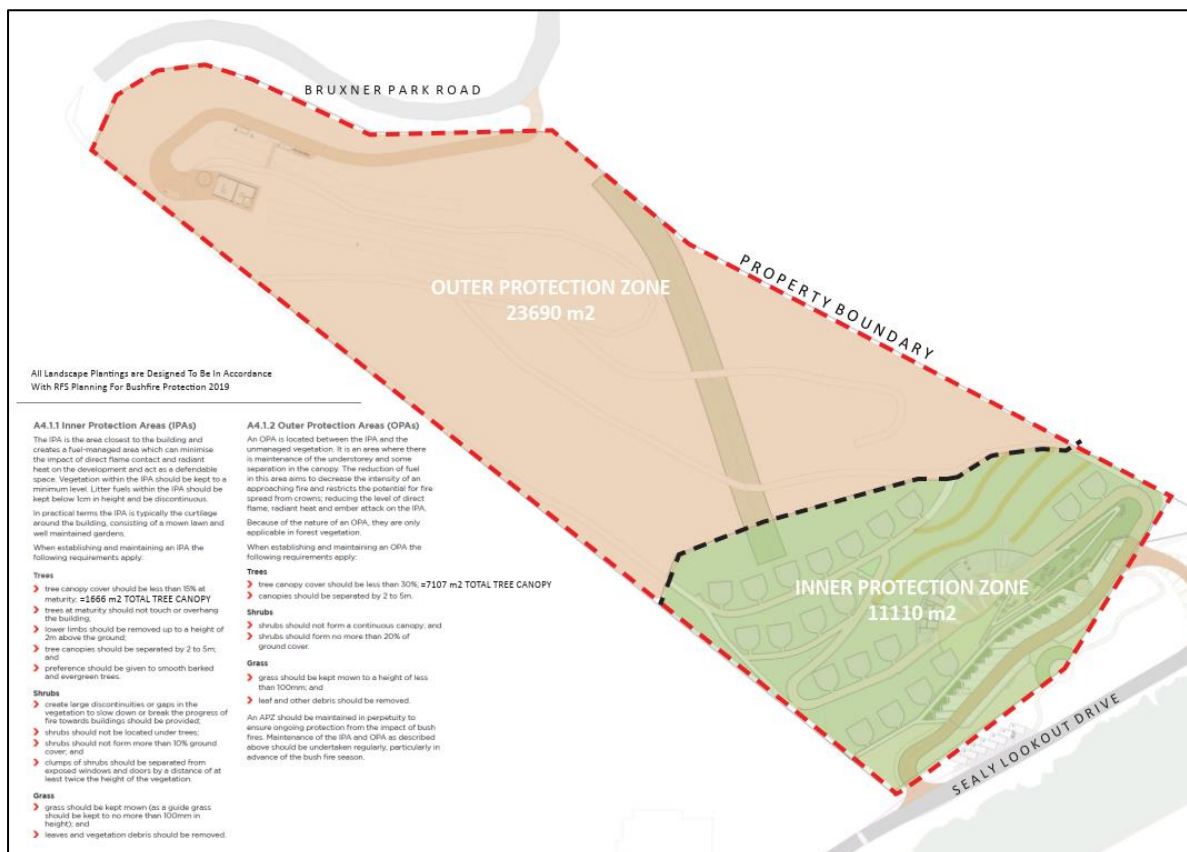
Landscape Plan: L101 Asset Protection Zones (Source: Myrtle Studio))
